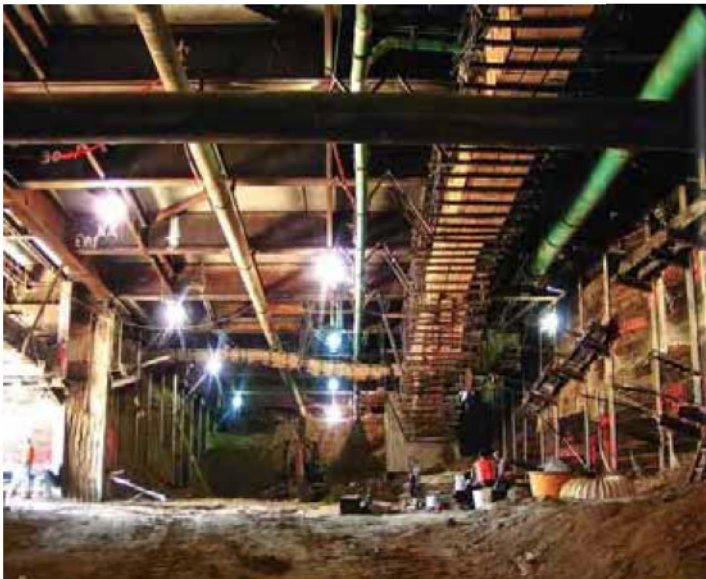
Utilities Hung from Deck Beams (Close Up)
